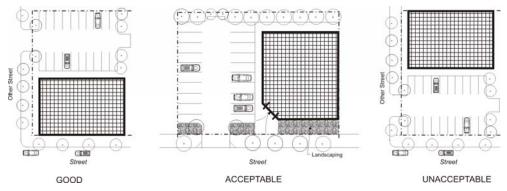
B.3.k. Requirements for surface parking location. (This diagram is for illustrative purposed only. See Section 18.120.020.3.f for stated requirements.)
